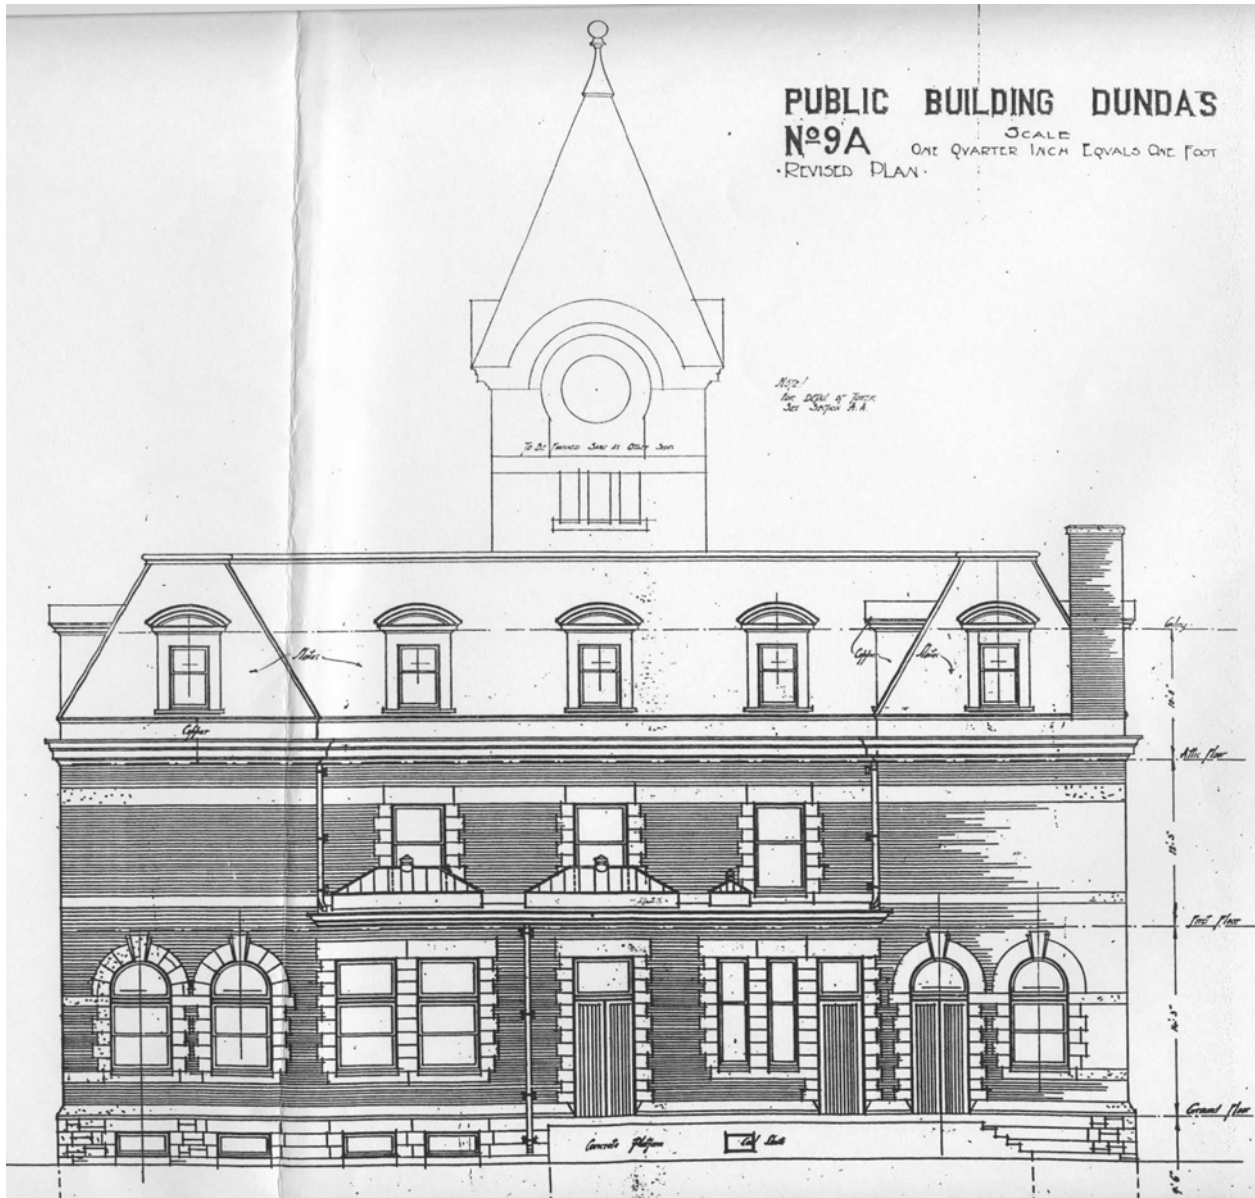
Drawing No. 9A (1911): Elevation to Lane (south), showing the more utilitarian vertical board wood doors at the rear for staff use opening onto the concrete loading platform and the original chimney at the south-east corner of the building (still extant in a widened form as shown in [Photo 20](#)). Also shows the three original skylights.
